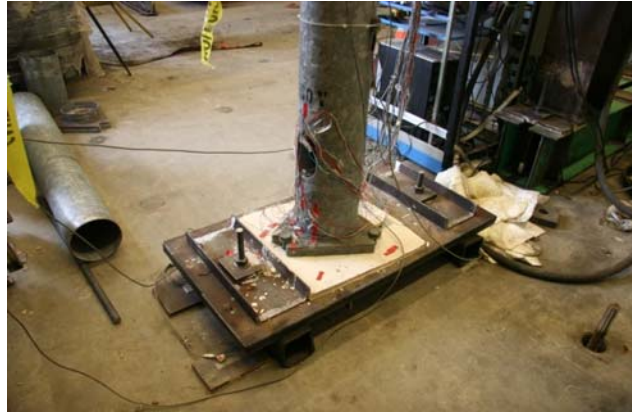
Photograph of assembled luminaire pole mounting plate
